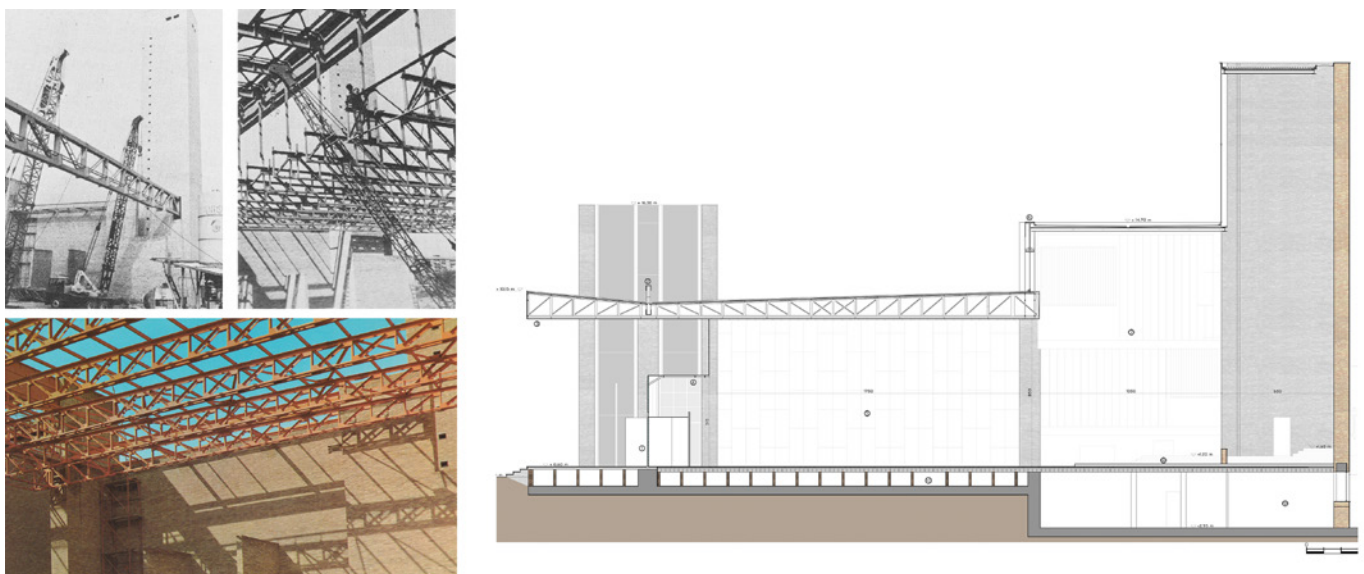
On the left, photographic documentation of the construction site: installation of the roof and assembly of the main facade © 1971, G. Roversi [8]. On the right: section of the building © 2015, L. Vecchio.
